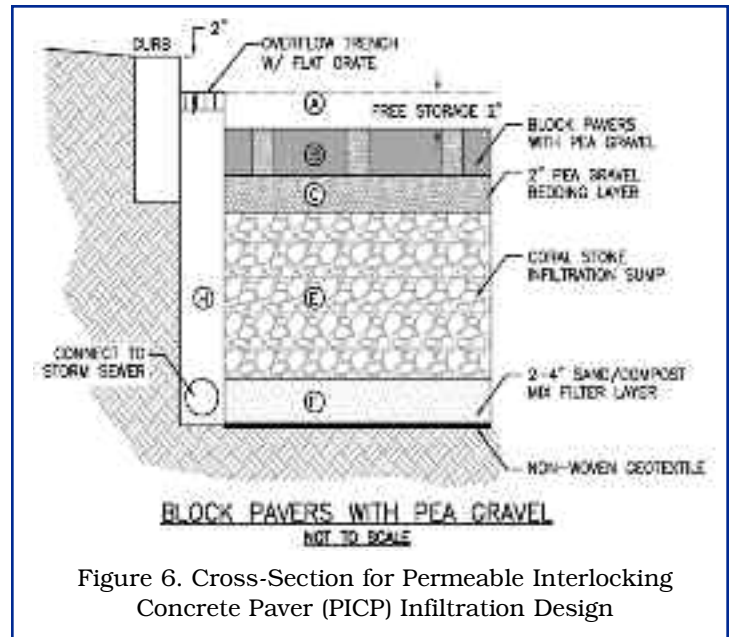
Cross-Section for Permeable Interlocking Concrete Paver (PICP) Infiltration Design
